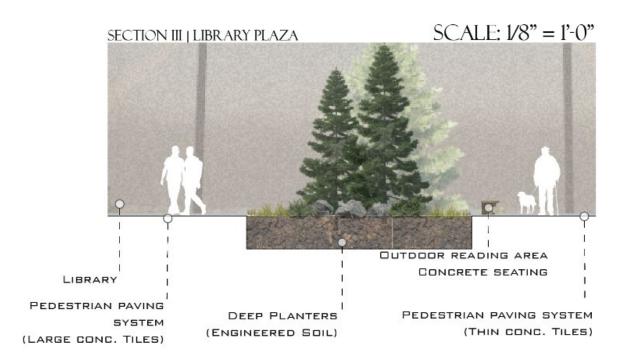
Small section of the Library Plaza Note: This is section III (Sec III) on the master plan.
